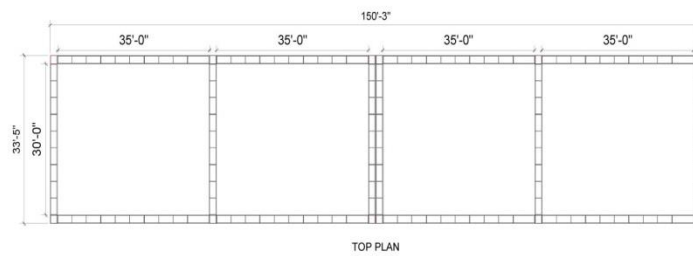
EXHIBIT D HERITAGE STAGE PLAN DETAIL
